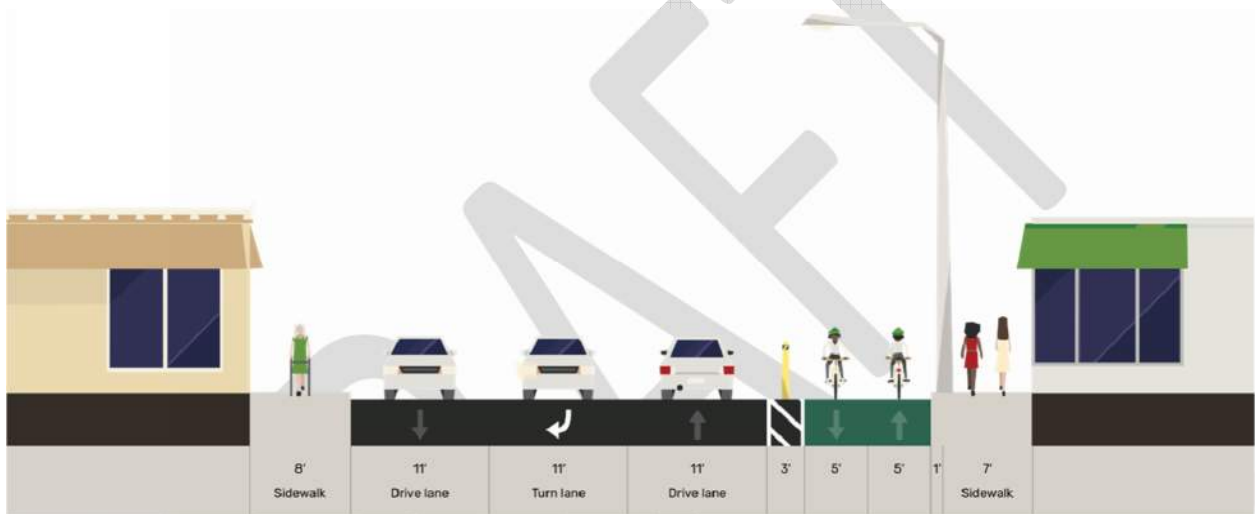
Beach Street (Eastbound) East of Industrial Rd to Walker Street
